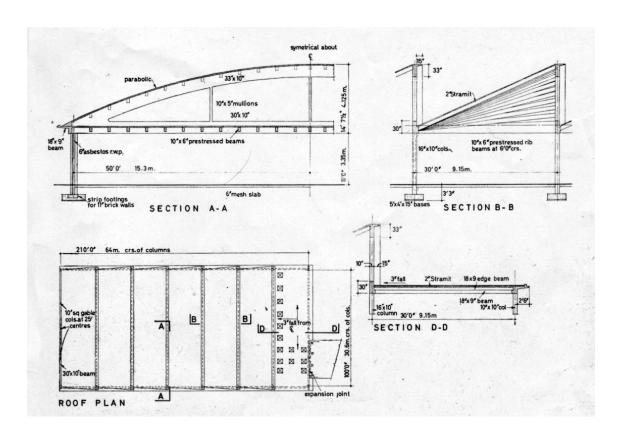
Manchester College of Building: detail of conoidal roof to workshop
